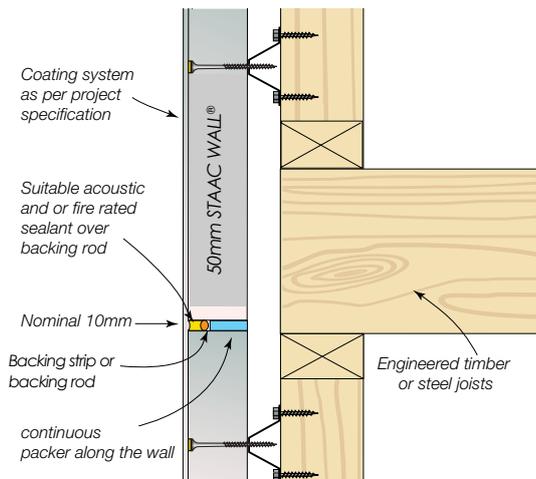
Typical detail for control joints positioned away from a corner
